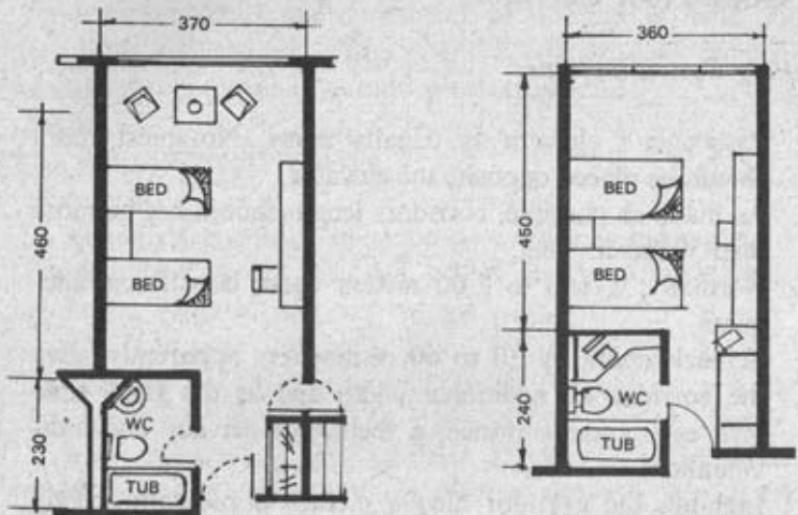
PLAN OF A HOTEL TWIN BEDROOM
